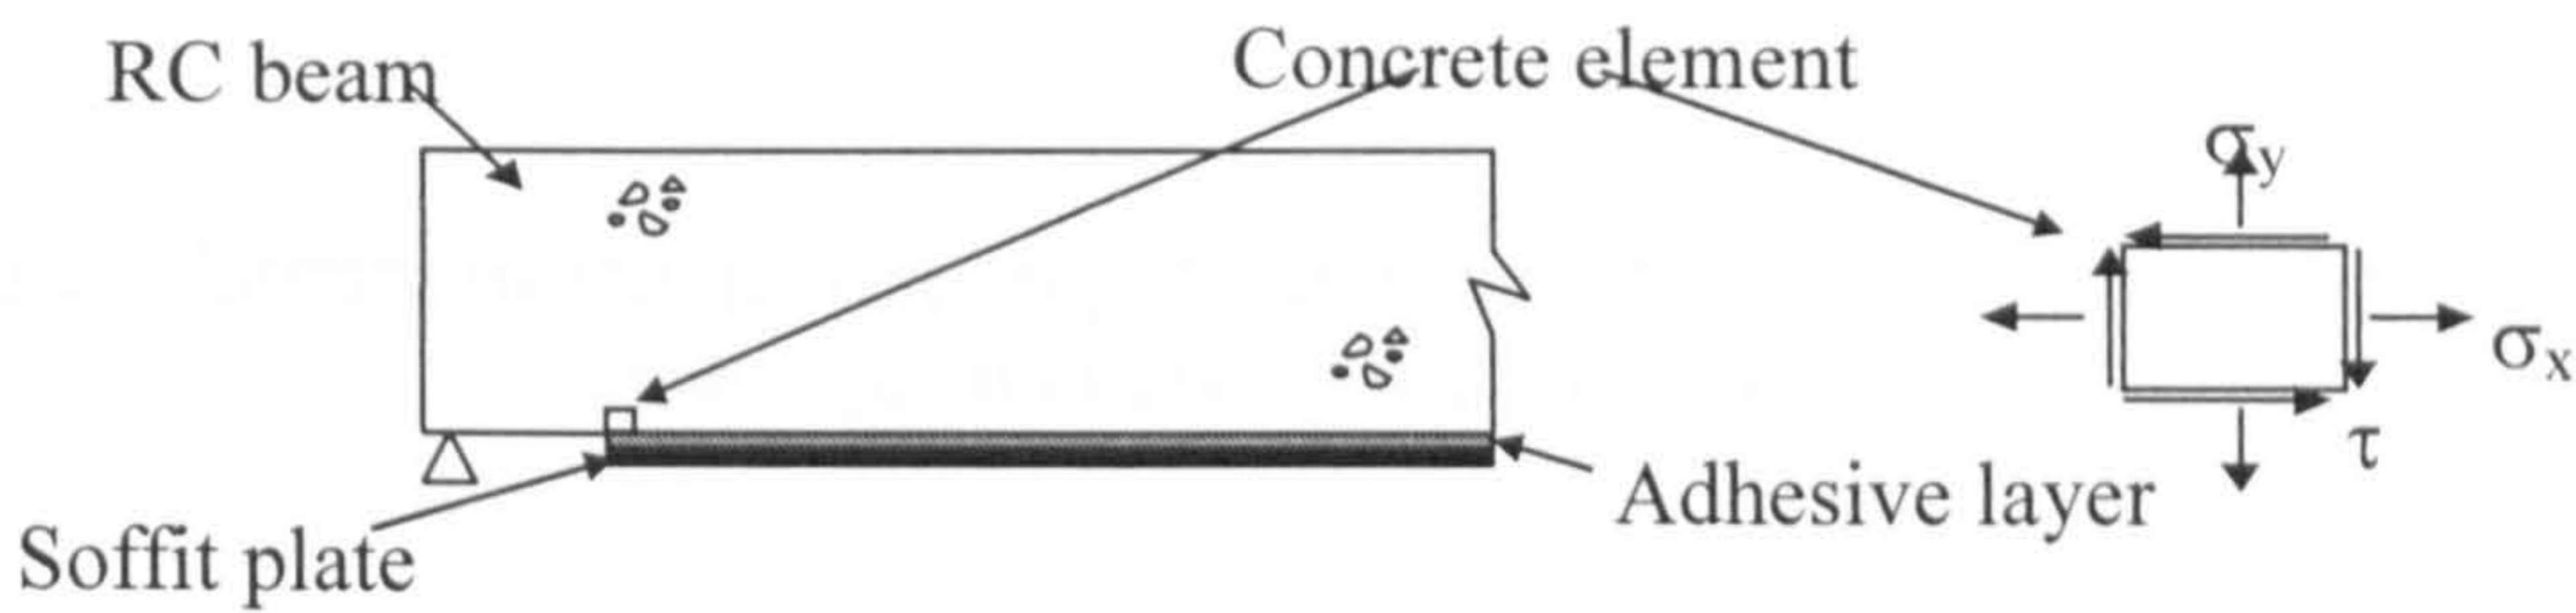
Stresses acting on a concrete element adjacent to the plate end (Teng et al. 2001)
